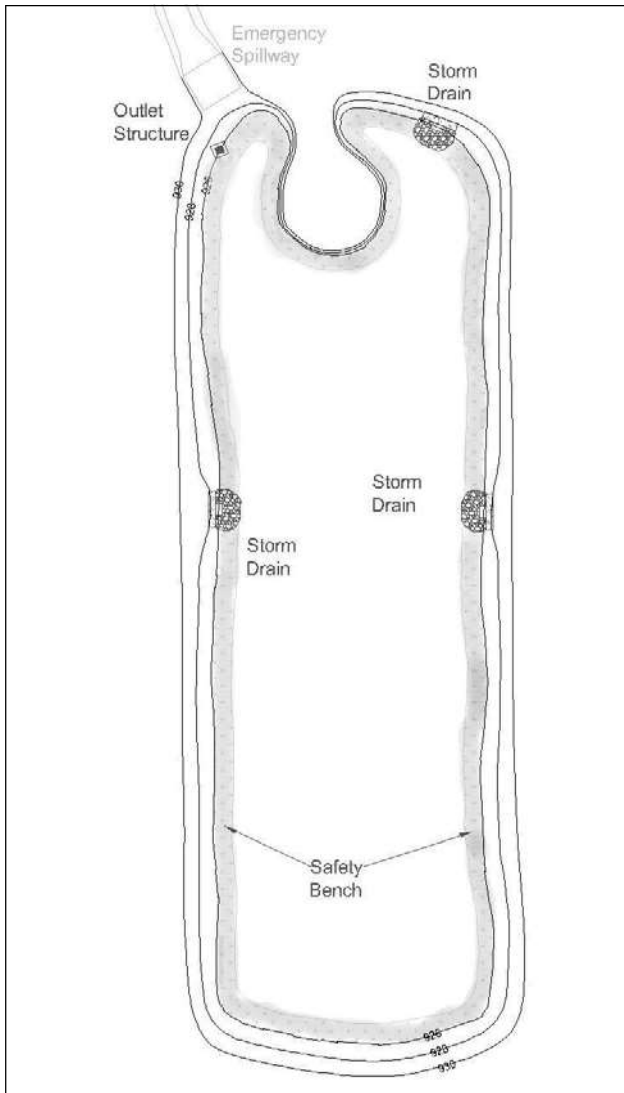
B.4. Preliminary Plan View of Wet Extended Detention Basin (not to scale).
